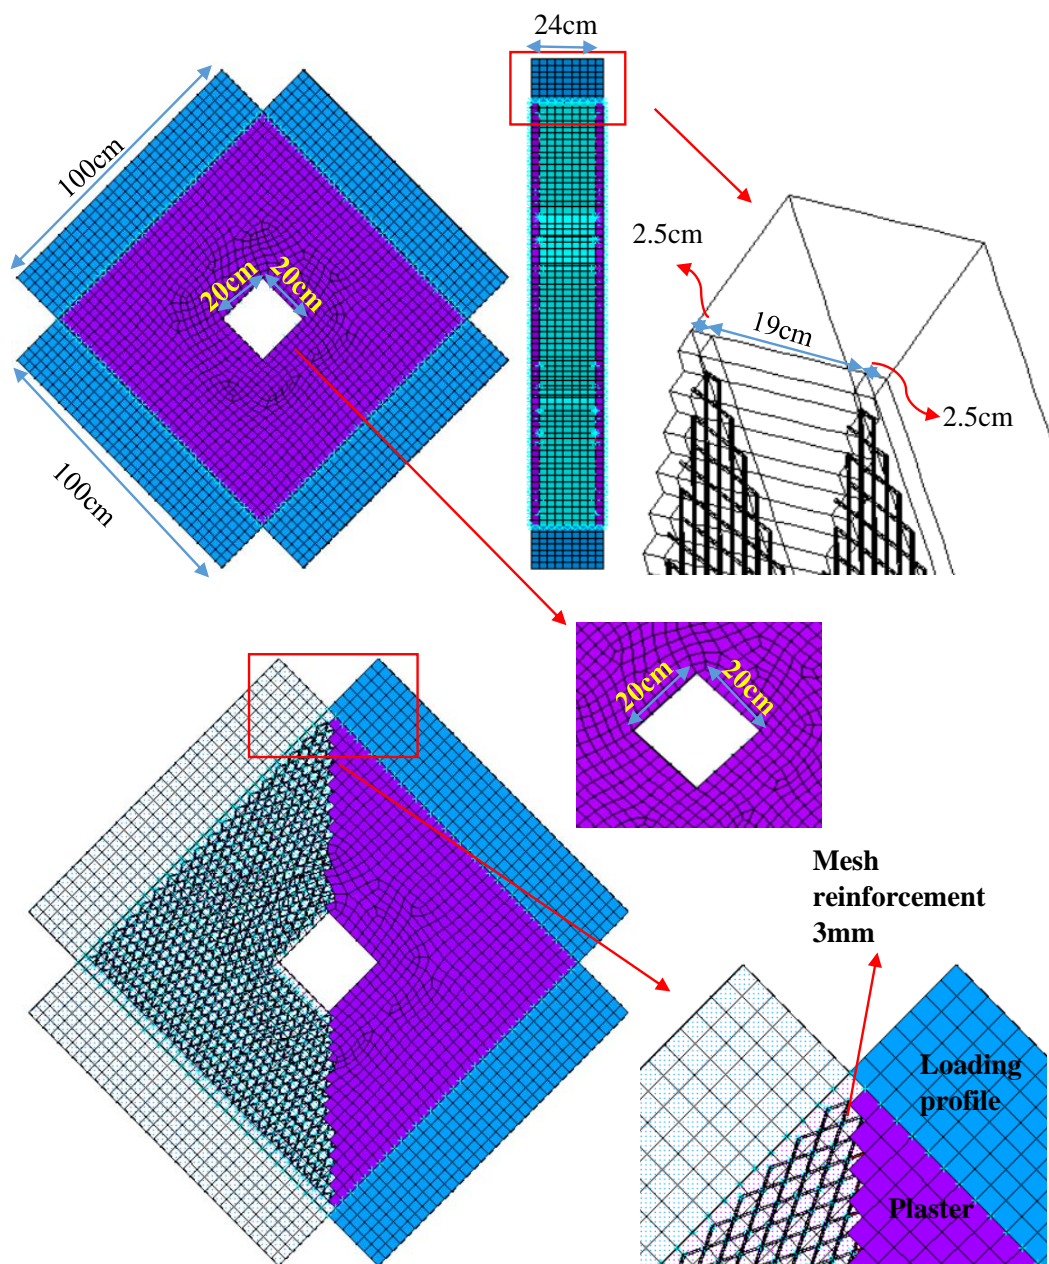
20% opening ratio of the masonry wall model-3mm mesh reinforcement
